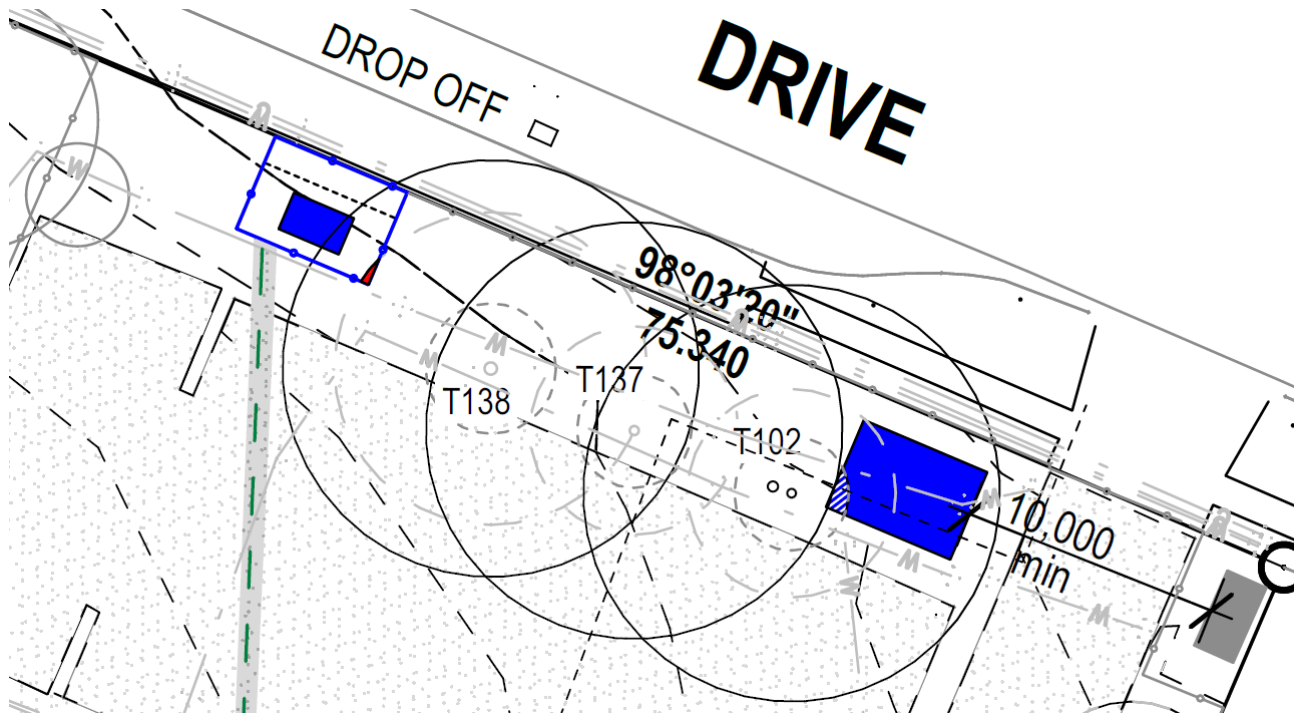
Location of Substation and Fire Hydrant Booster. Source: Fulton Trotter Architects
